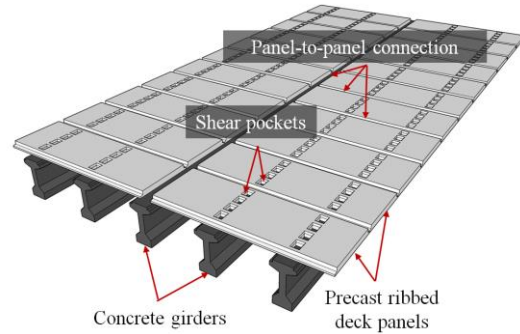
Ribbed bridge deck slabs in the bridge superstructure
